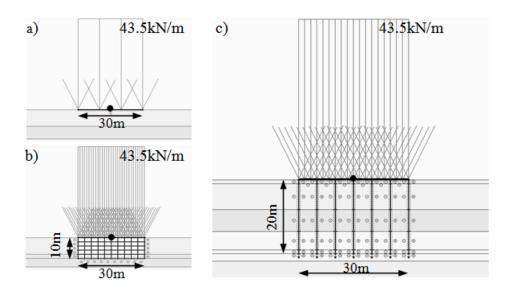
Analysed foundation types: a) shallow foundation, b) deep basement foundation, c) piled foundation.
